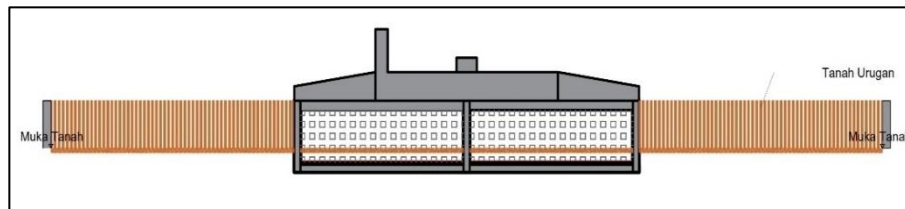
Alternative design of Floating Foundation on Bridge Abutment
